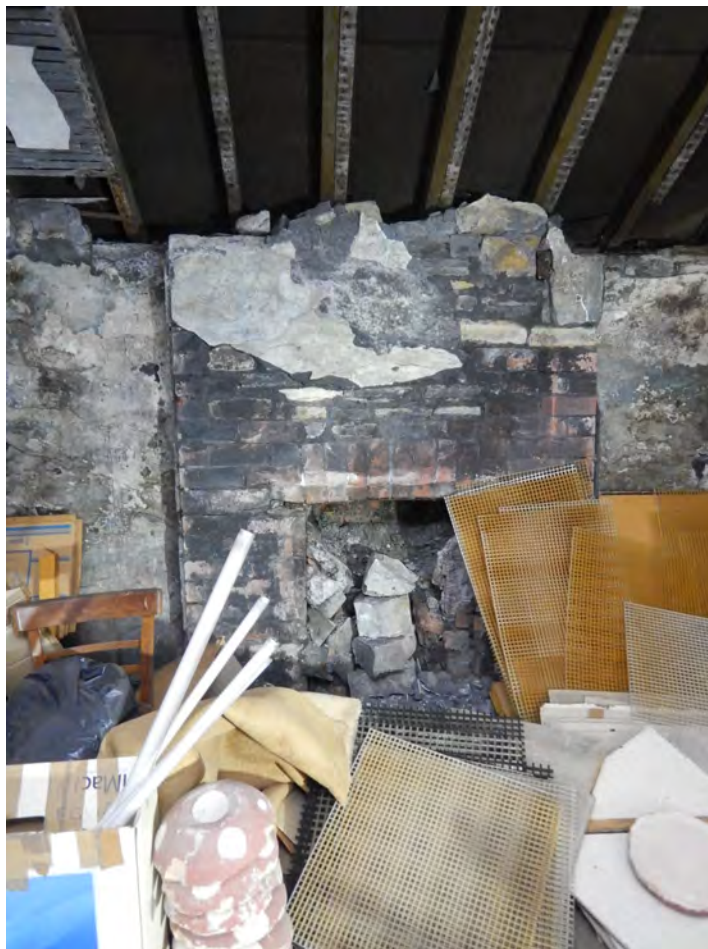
Fireplace on north-east wall of Room 10, looking north-east
